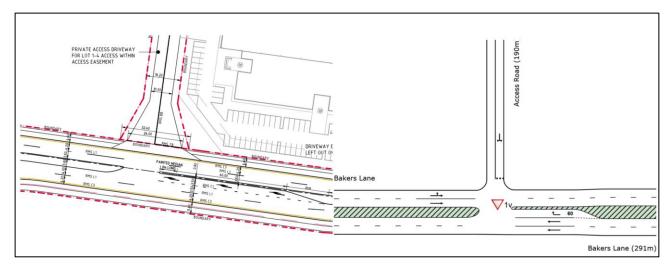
Intersection Layout Access Road / Bakers Lane (in 2026)
